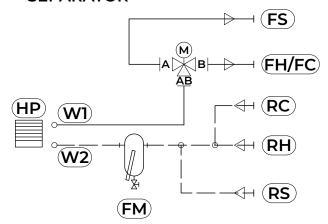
Magnetic dirt separator installed on the return pipe of the heat pump
